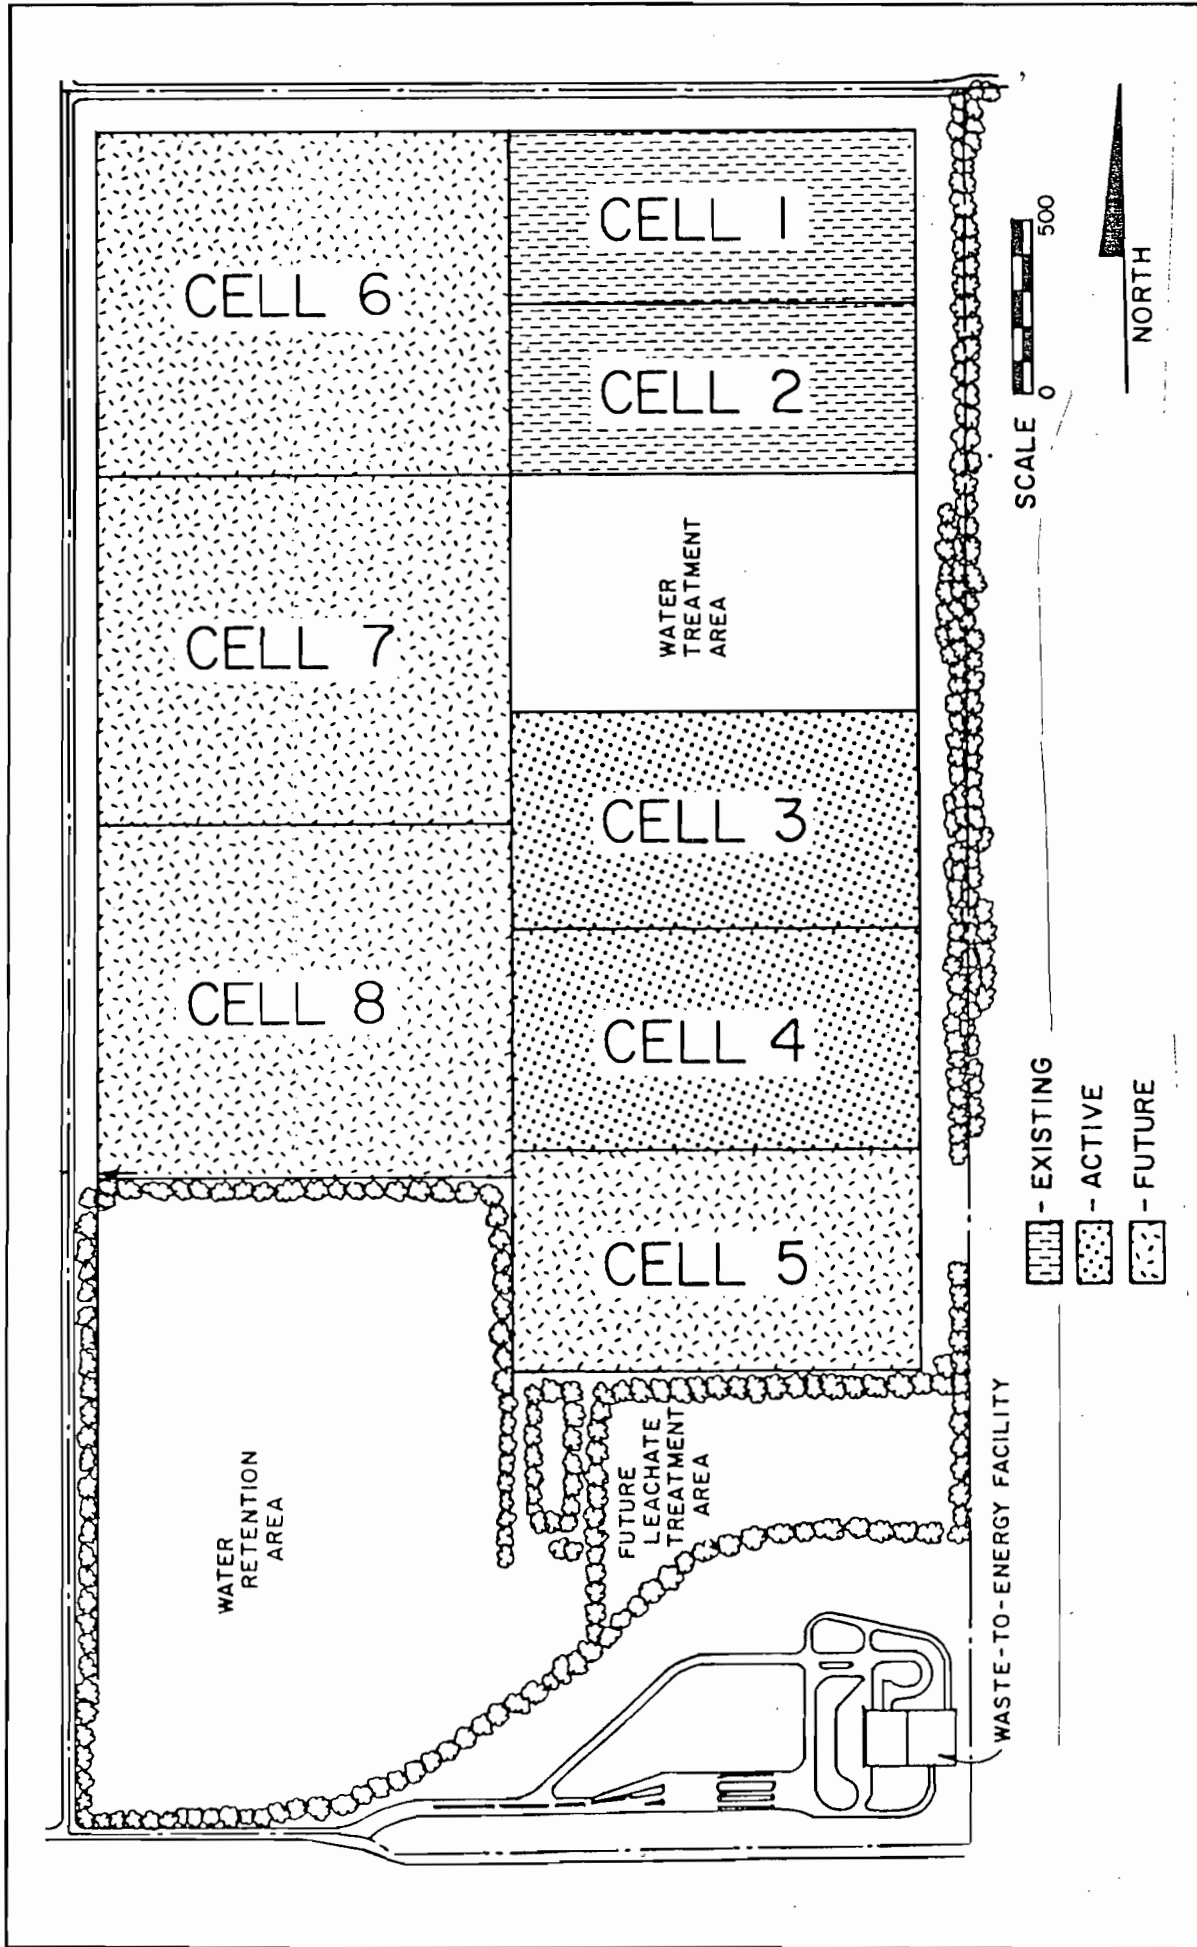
NAPLES SANITARY LANDFILL SITE PLAN
